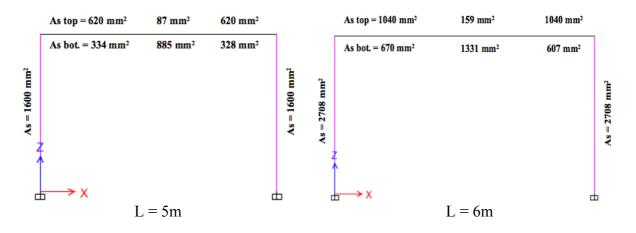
The effect of span lengths on the steel reinforcement of frames
